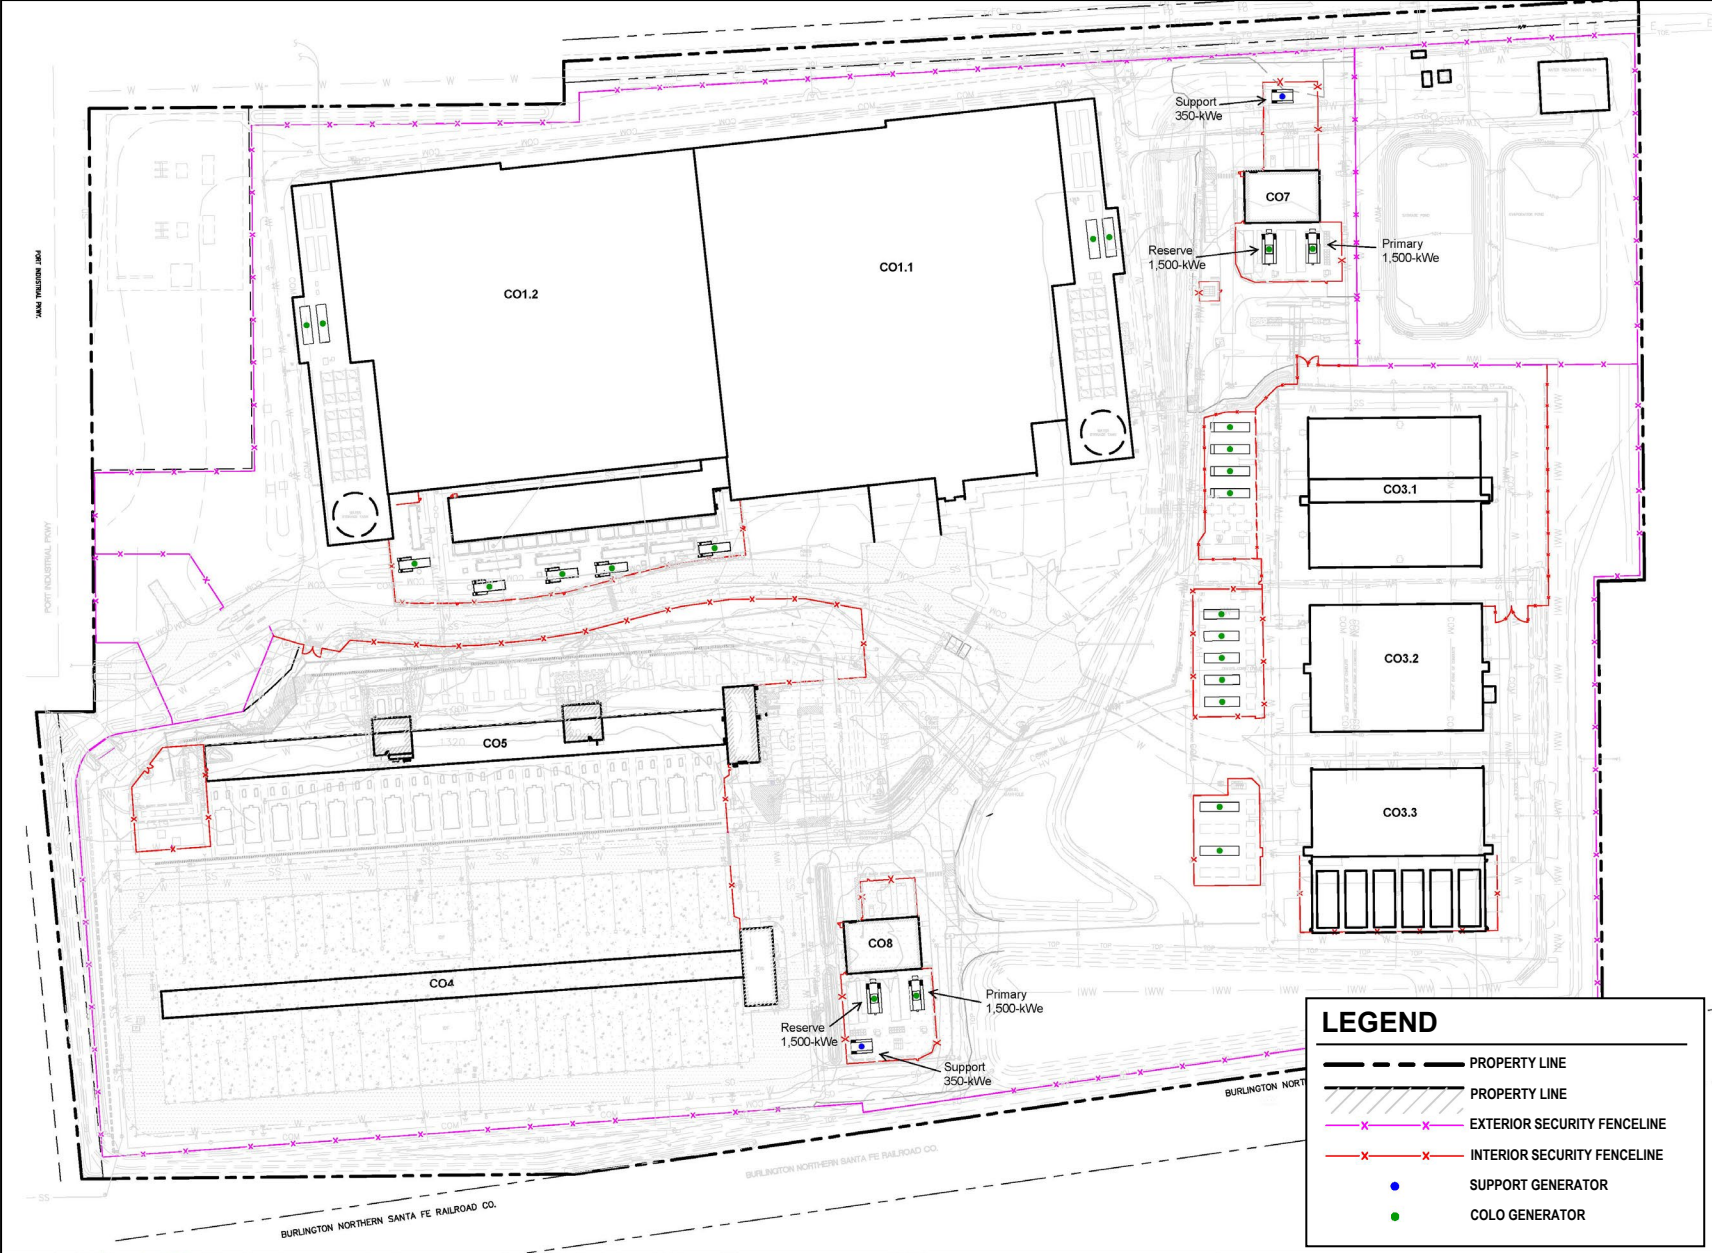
Plan View Site Map, Columbia Data Center
